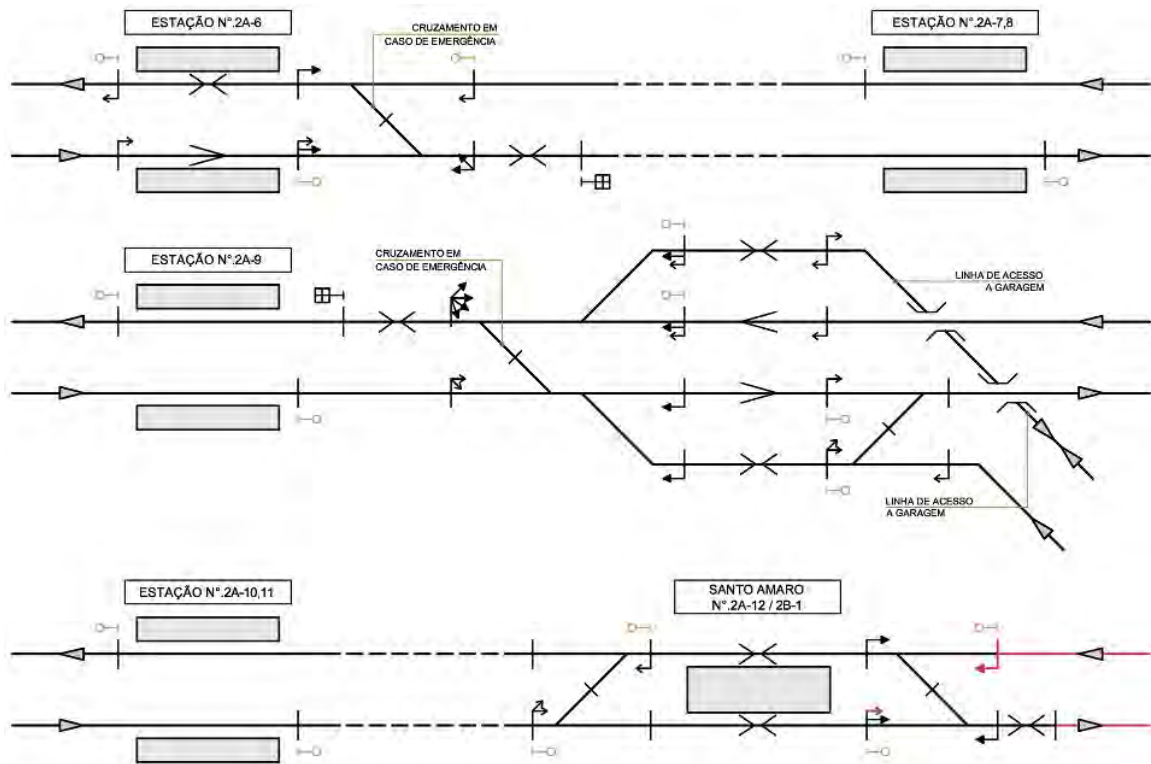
Track Layout and Signaling Arrangement of Line-1A
